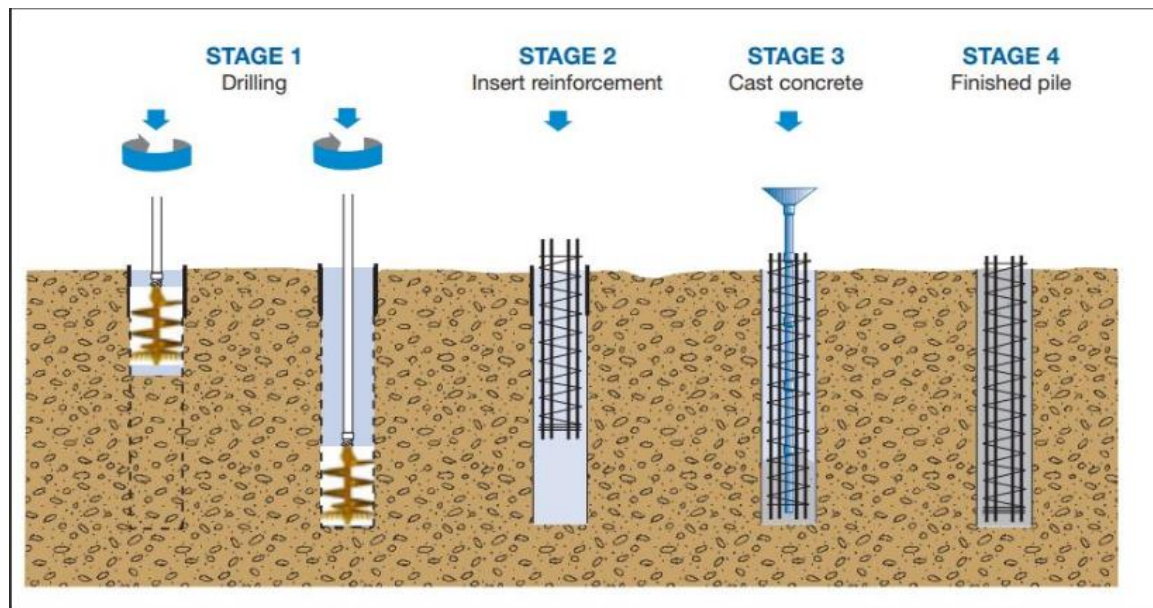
Example of bored cast in place reinforced concrete piles (note that temporary casings which may be used to prevent bore hole from collapsing is not shown)⁵.
